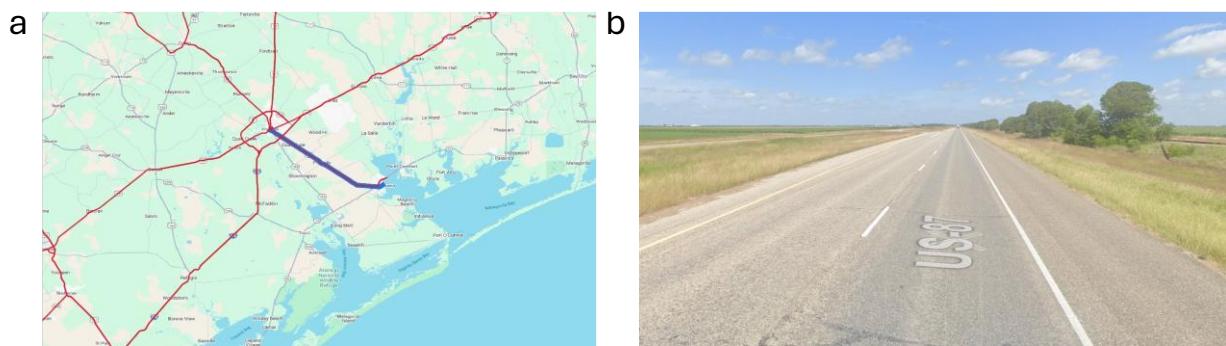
US0087 Case Study: (a) Location and (b) Typical Pavement Surface View.
